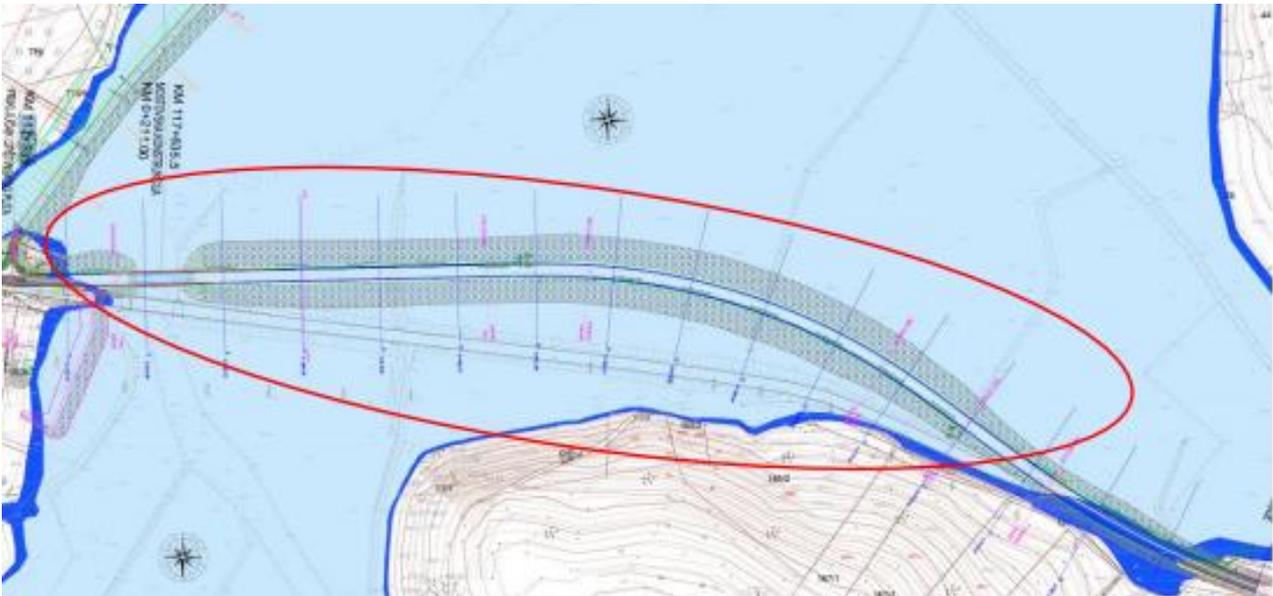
Location of the old and new alignment of the State Road IB-21 (Source: Conceptual Design for the State Road IB No.21)
